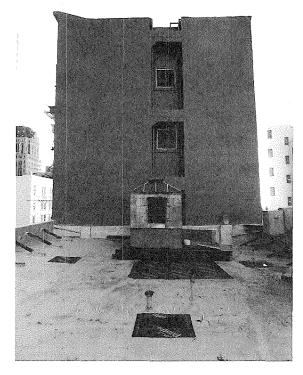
Photograph of roof, looking south towards elevator penthouse and adjacent building (photograph taken on 02/27/2018).
